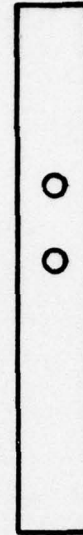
Test #9--Web cross section with two tendon ducts
